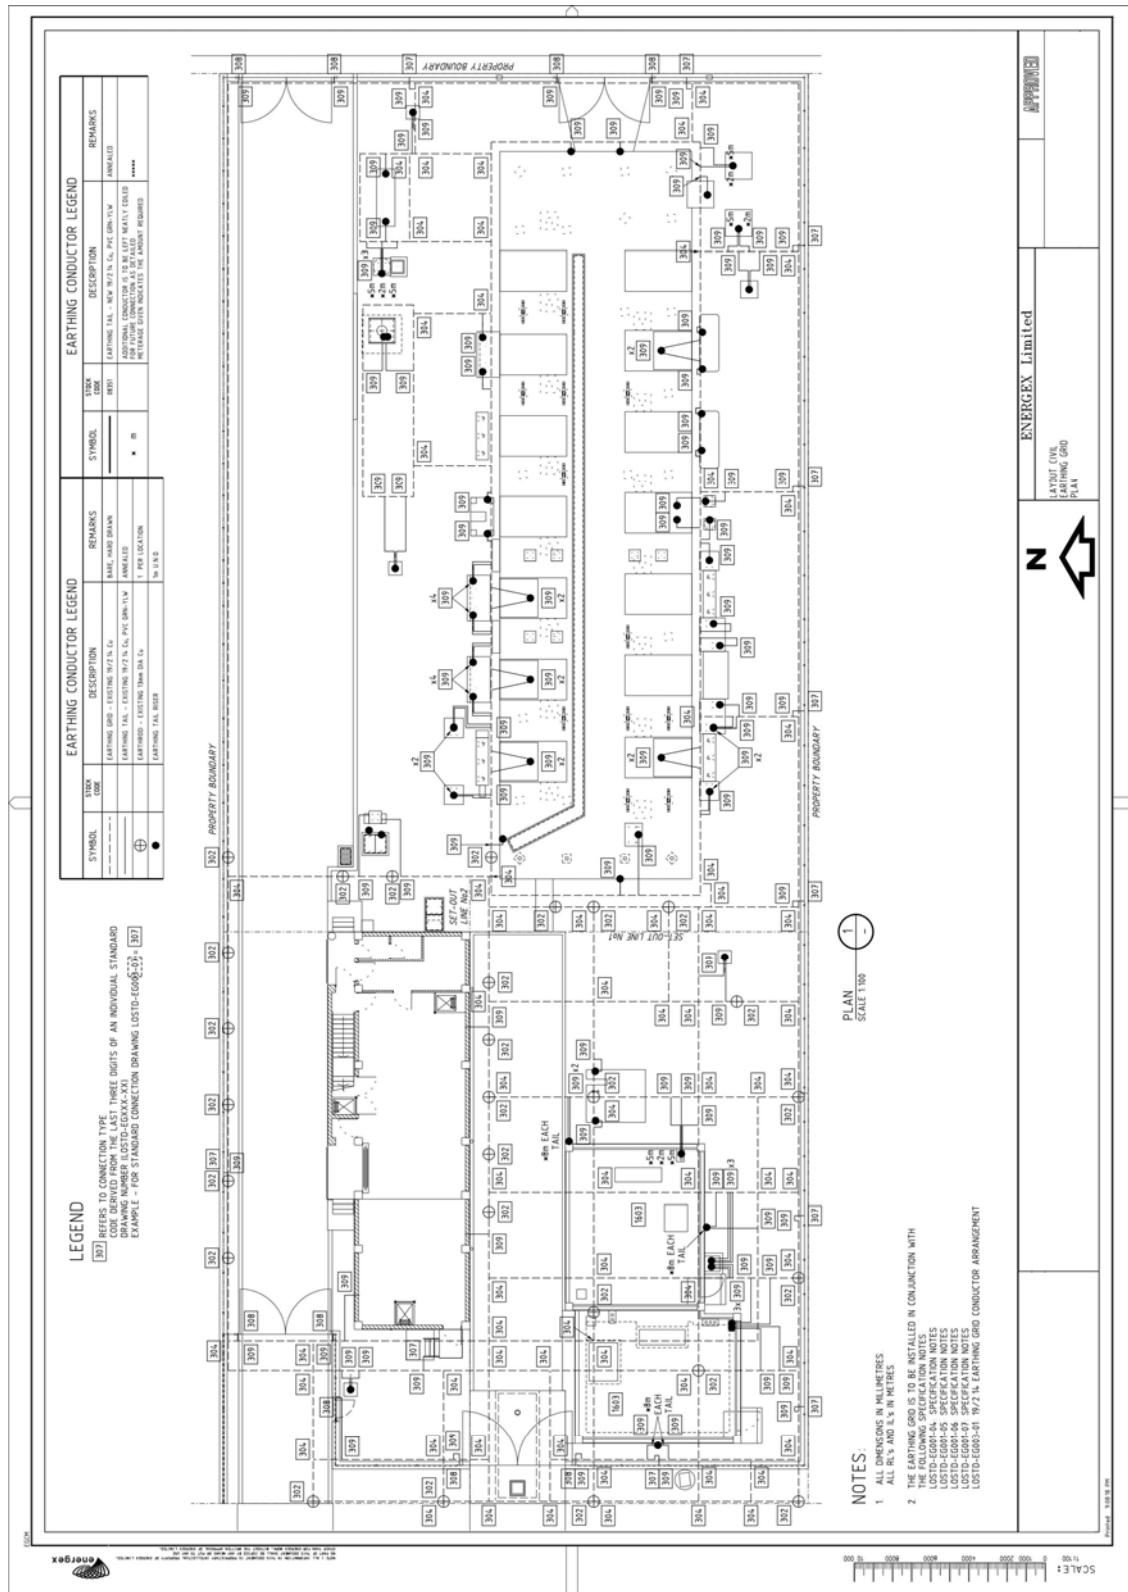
Substation A earth grid plan used for modelling (Source: Energy QLD).
